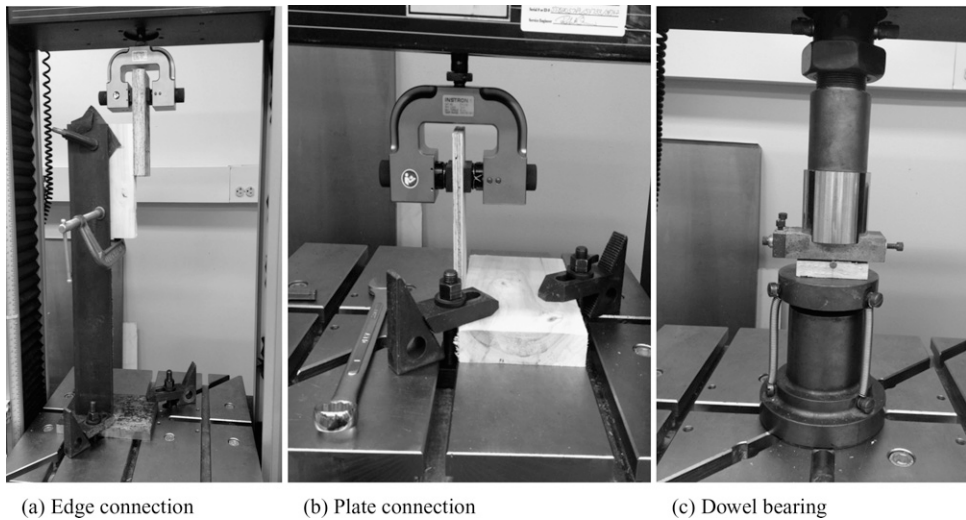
Test setup (a) edge connection tests; (b) plate connection tests; (c) dowel bearing test.
